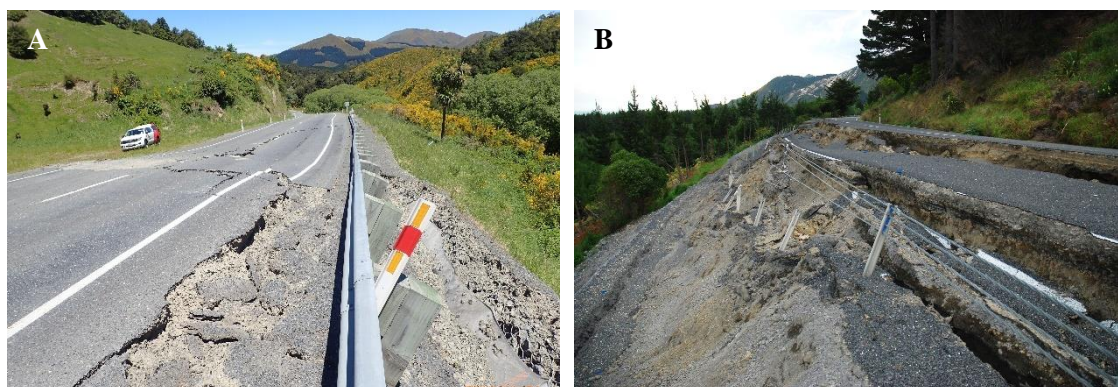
Examples of failure of gabion basket retaining walls. (A) Overturning failure. (B) Translational failure due to underslip.
